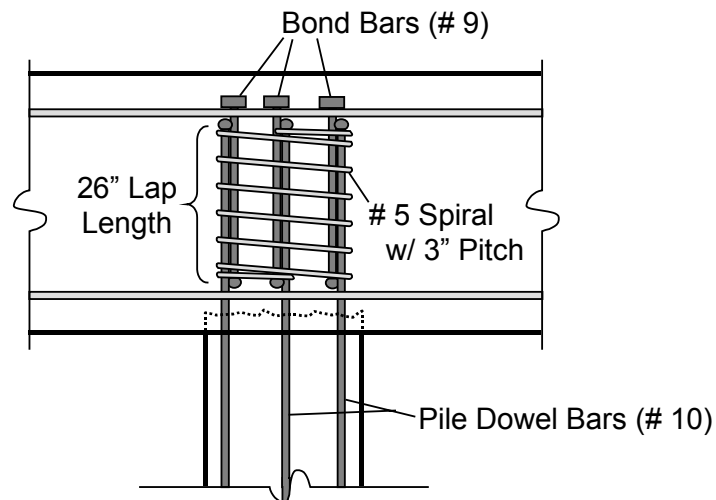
Pile/foundation connection studied at University of California, San Diego
